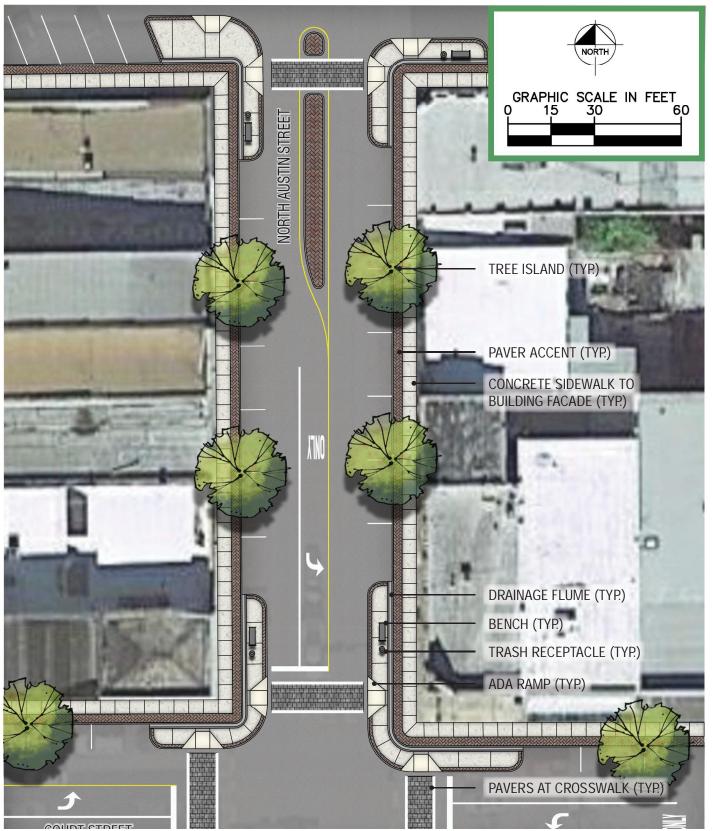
Typical Street Improvements (Austin Street north of Court Street)
